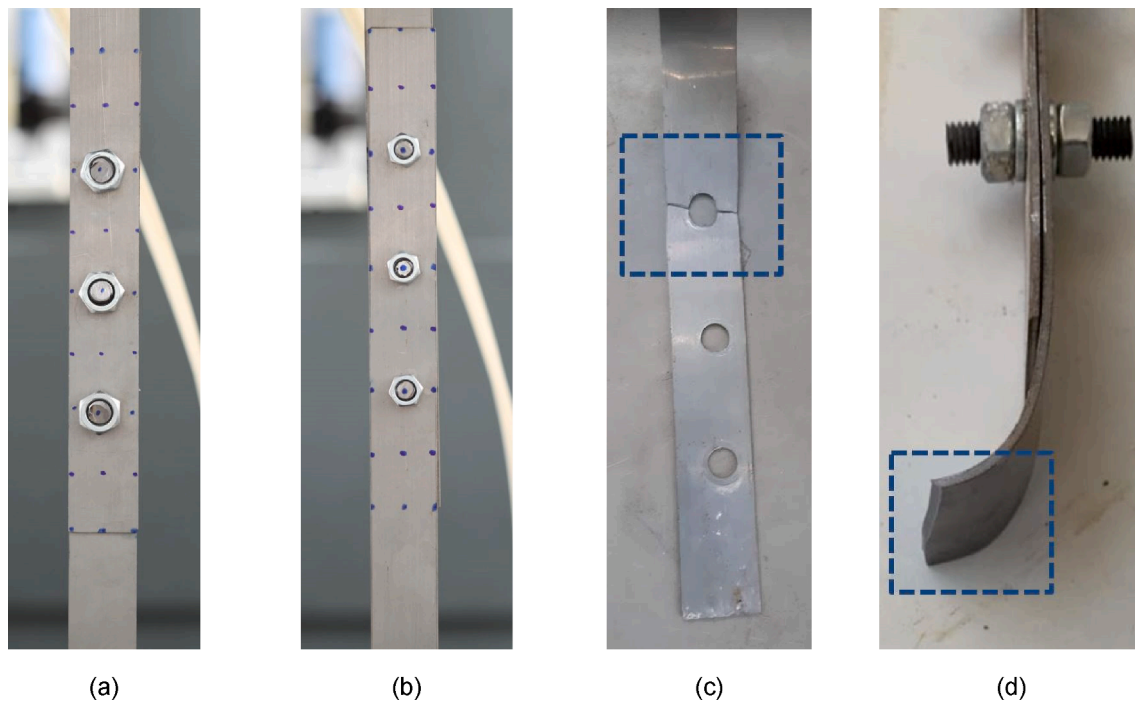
Anchorage system and local failures of strips: (a) anchorage with screws Ø10 mm; (b) anchorage with screws Ø8 mm; (c) tensile failure at the perforated section of strip S3 during test R-B12C; (d) tensile failure at the corner of strips S3 during test R-B15C.
